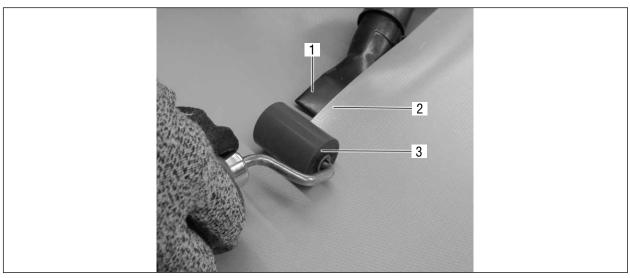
Sealing of the roof membrane via hot air welding
